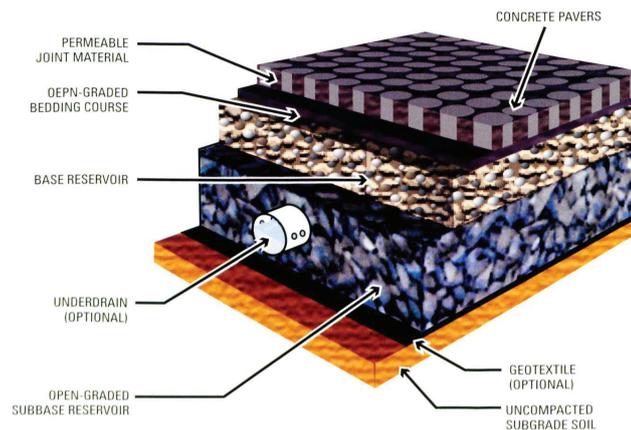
Structure of Permeable Pavement¹⁶¹
